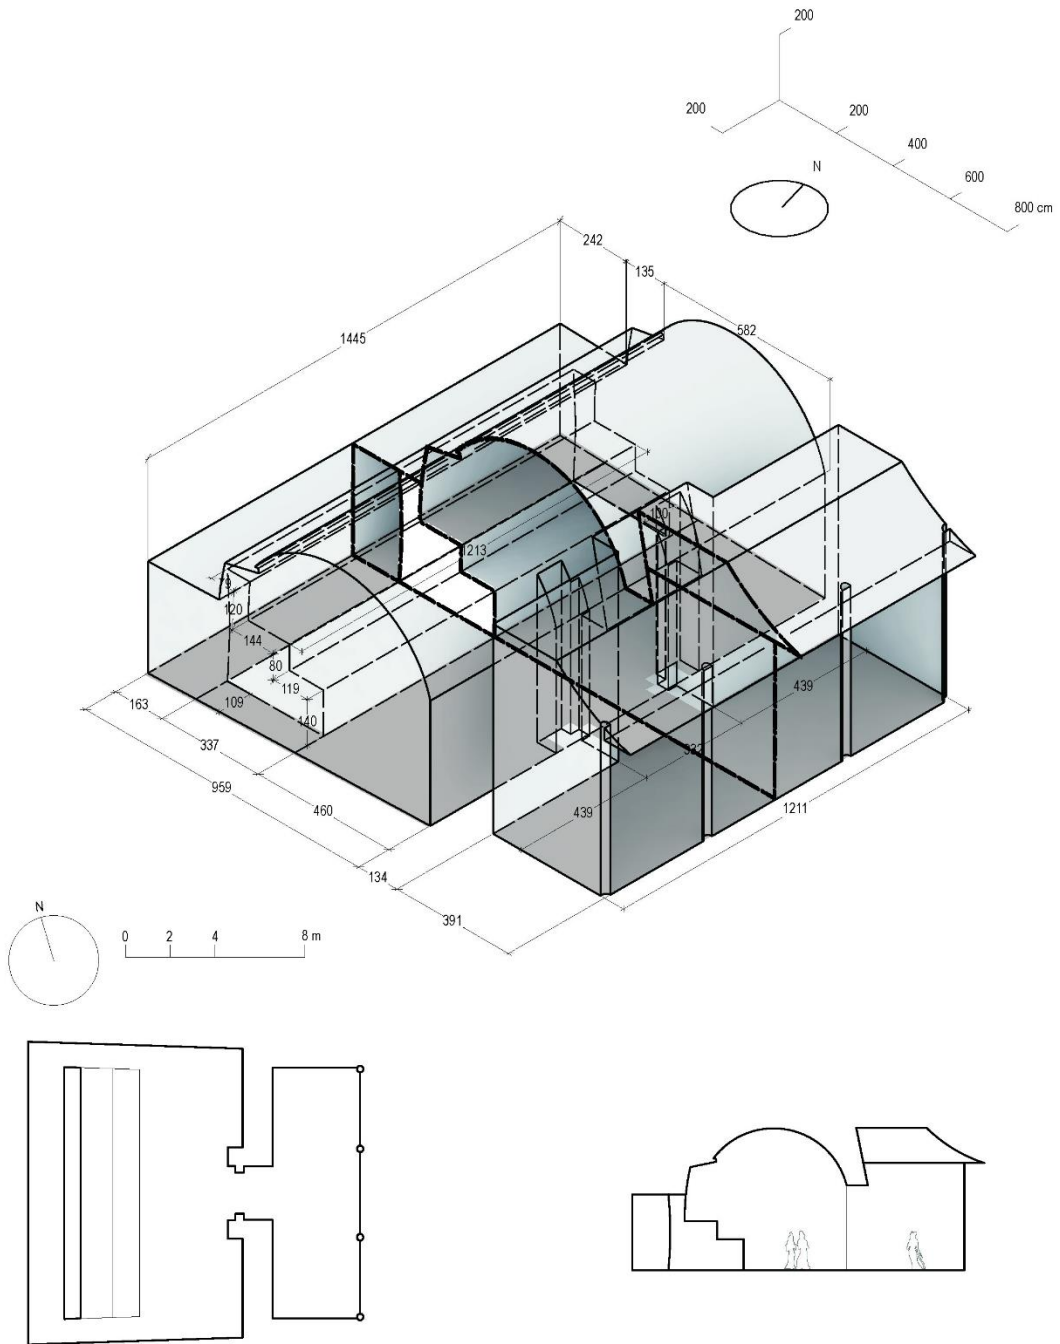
Isometric view, plan, and sectional drawings of Mogao Cave 365. Drawing by author.
